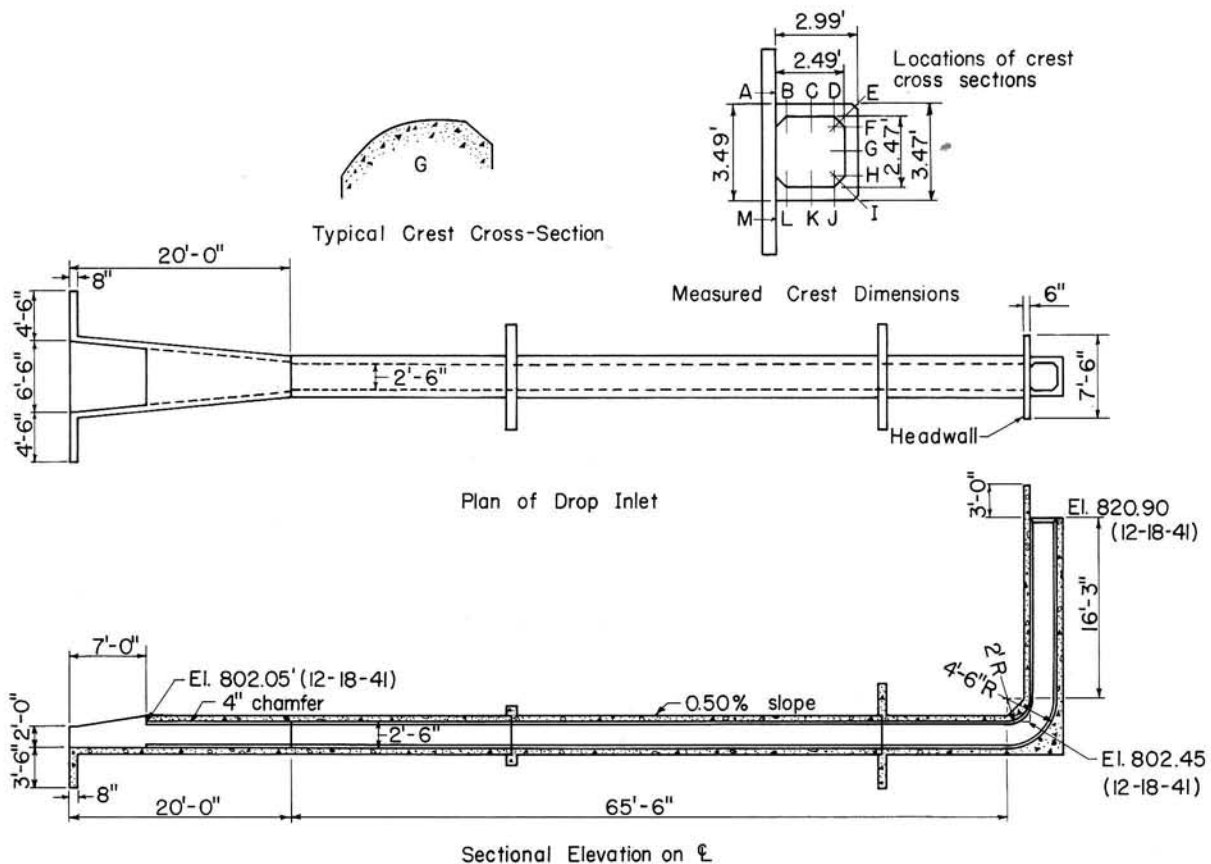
30-in. Square Drop Inlet Closed Conduit Spillway at McCredie, Missouri.
